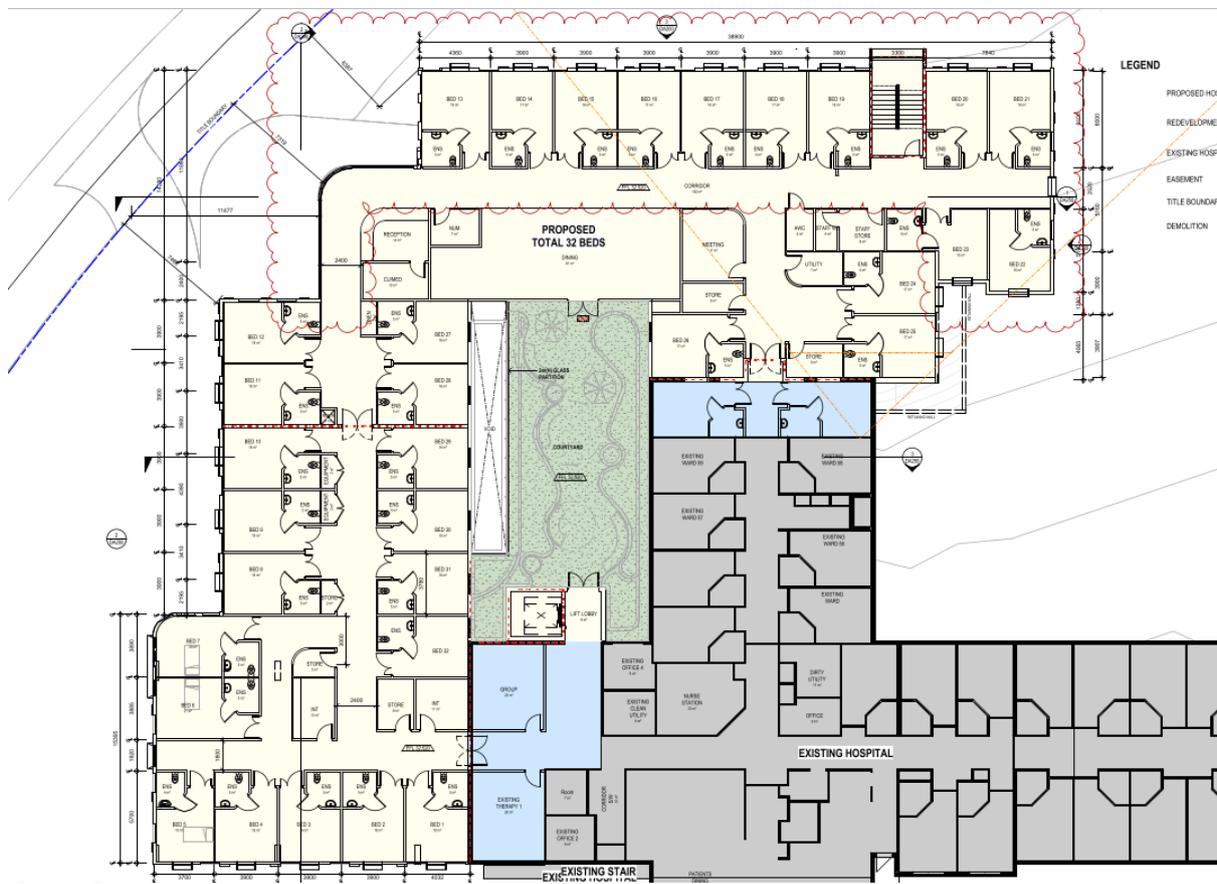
Proposed First Floor Additions - Mental Health Ward (source: HSPC)
